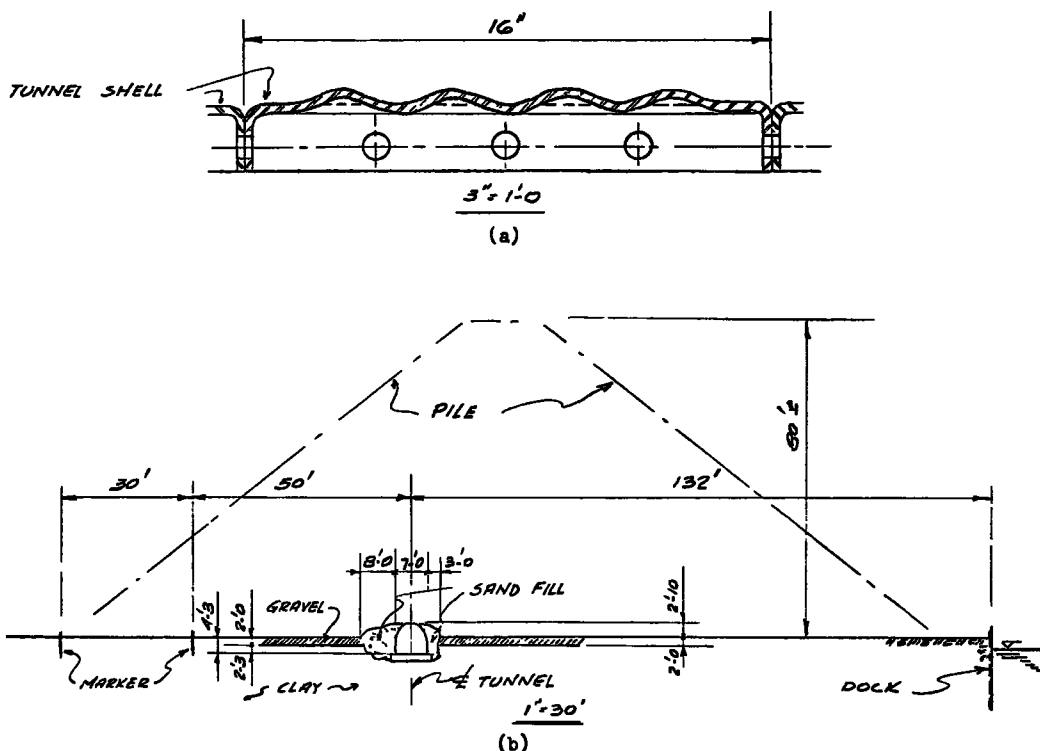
(a) Longitudinal section through liner plate, (b) section through tunnel and maximum size stock pile.
